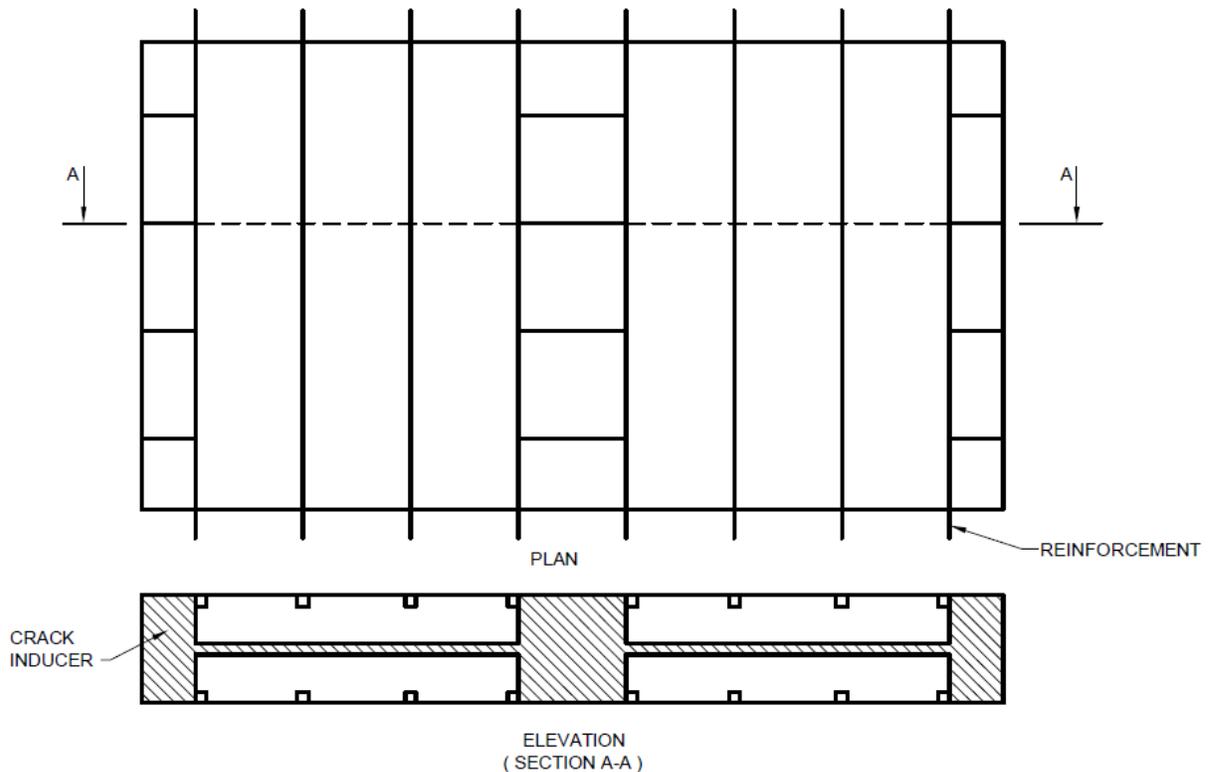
TYPICAL CRACKED CONCRETE TEST MEMBER
